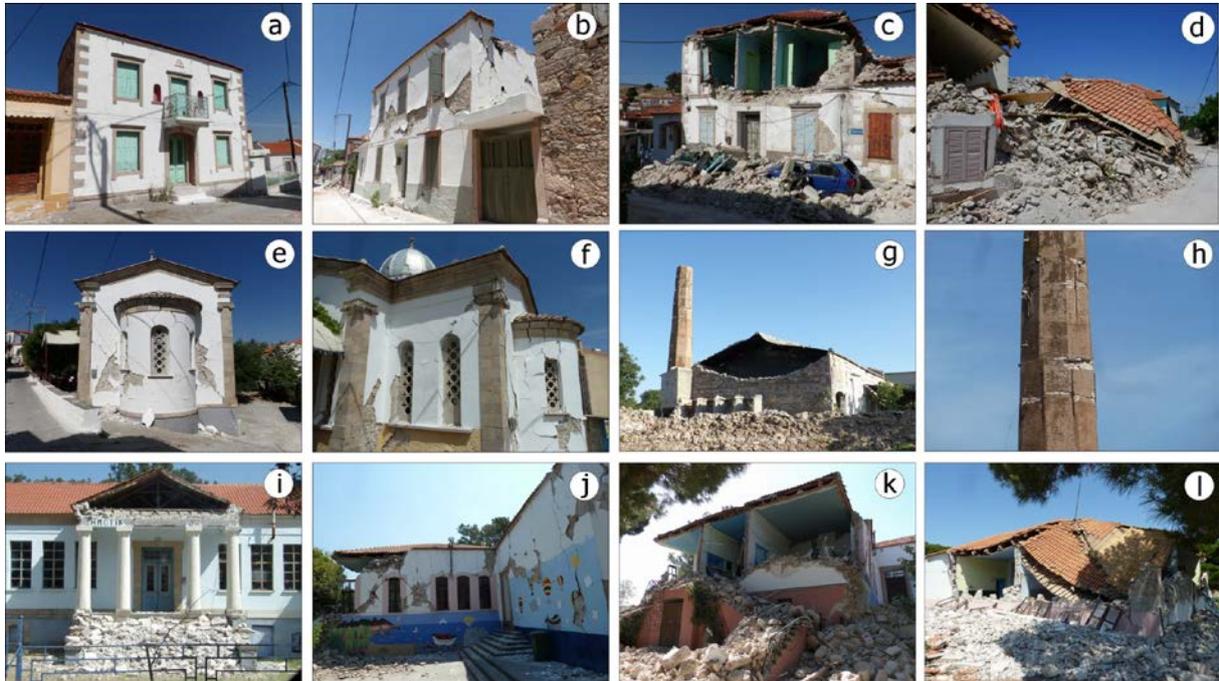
Representative photos of the observed damage in Vrissa settlement. (a) damage grade 2, (b) damage grade 3, (c) damage grade 4 and (d) damage grade 5 in masonry buildings with load-bearing walls. The masonry monumental buildings (e-f) and the masonry industrial buildings and related facilities (g-h) suffered damage similar to masonry residential buildings. (i-l) Masonry schools suffered similar damage. The Vrissa elementary school suffered near total collapse.
